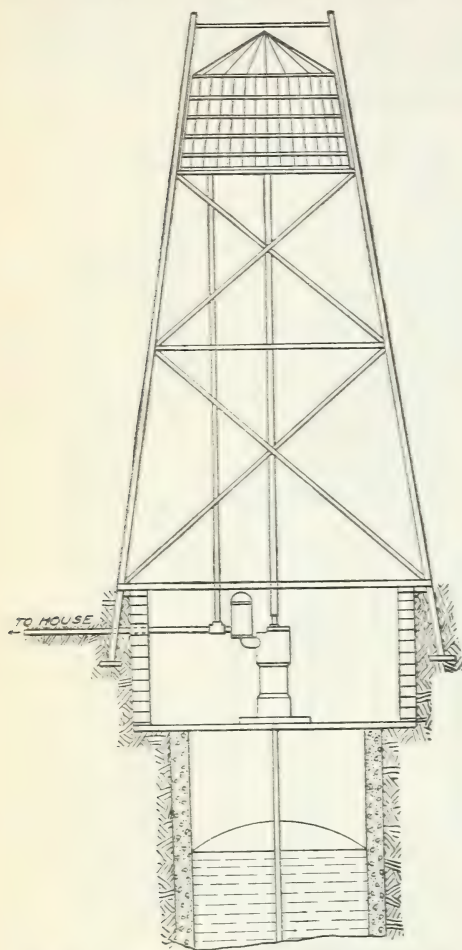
Gravity supply system with storage tank on windmill tower.
